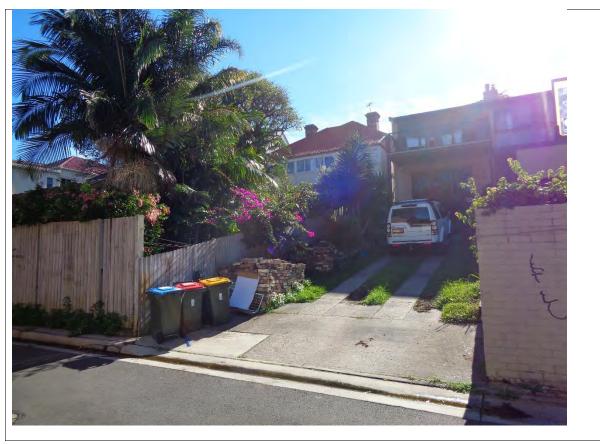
Site (with existing large tree) and neighbouring development viewed from Chesterfield Lane
